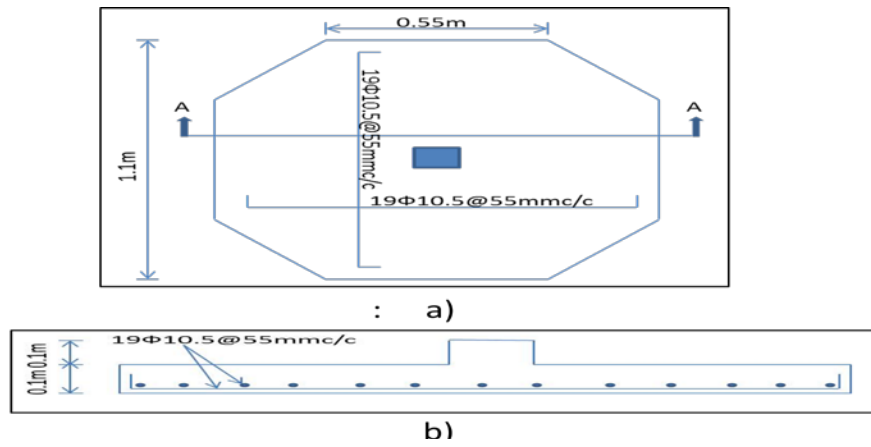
a.Slab specimen ,b.Section A-A in tested slab
